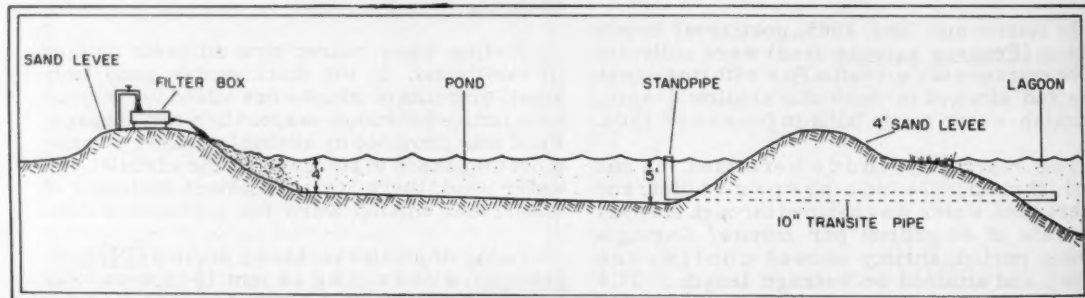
Cross section of pond showing location of filter box and standpipe.
